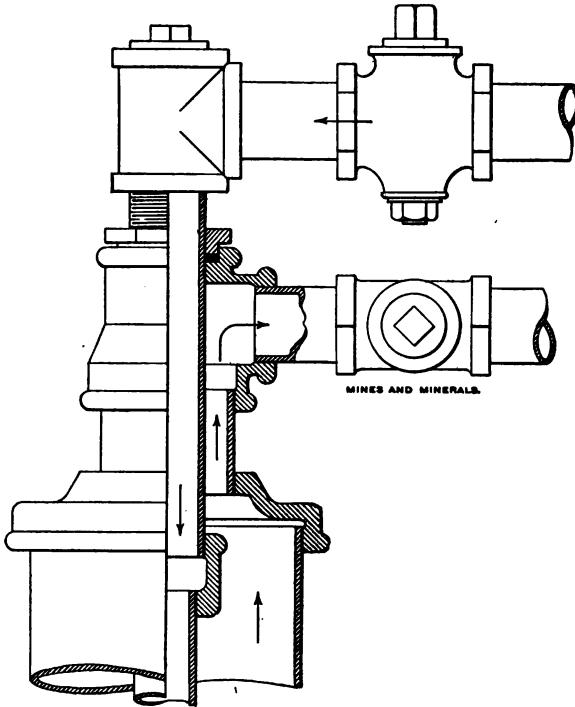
Connections of Top of Freezing Tube, Chapin Shaft
